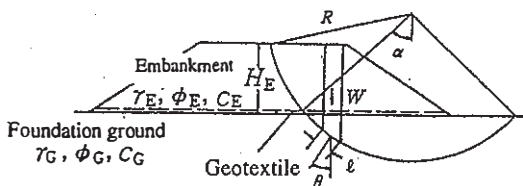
Stability calculation with respect to sliding failures which pass through into the foundation ground²⁾
